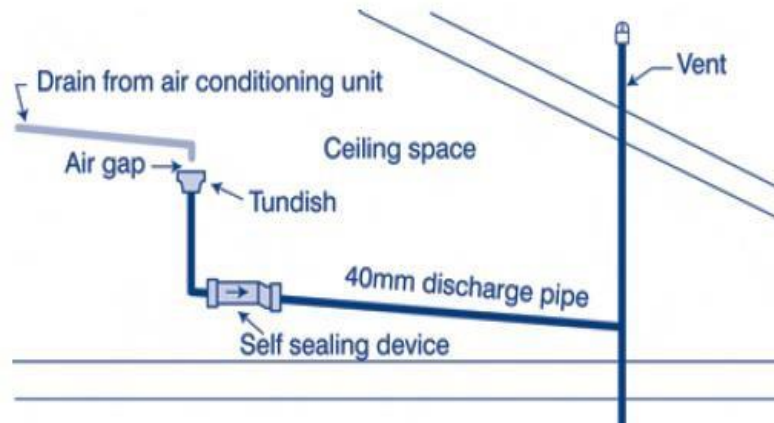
Waste or vent in a roof/ceiling space on-grade
